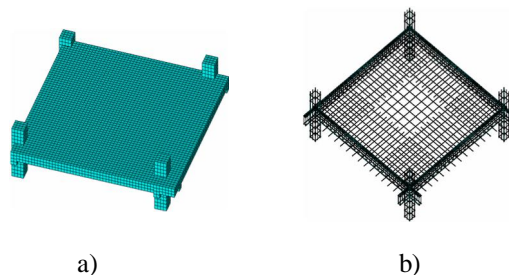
FE 3-D modeling of Experimental specimen a) Concrete and b) Reinforcement
